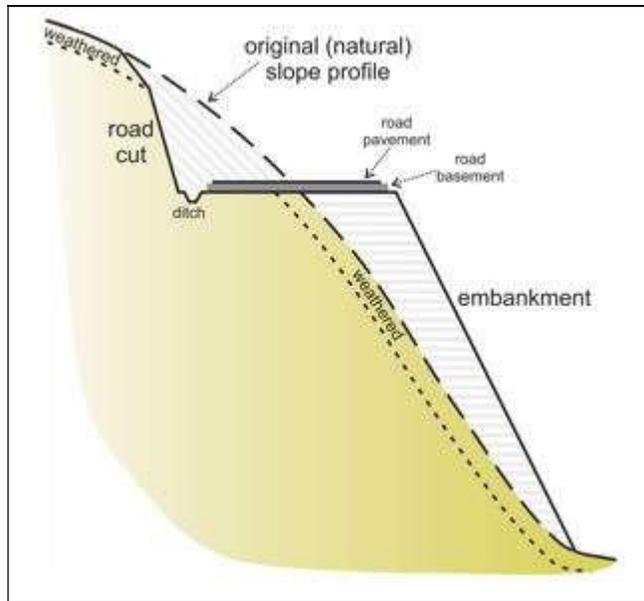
Road construction in mountainous terrain. The material excavated in the road cut is used as fill for the embankment.
